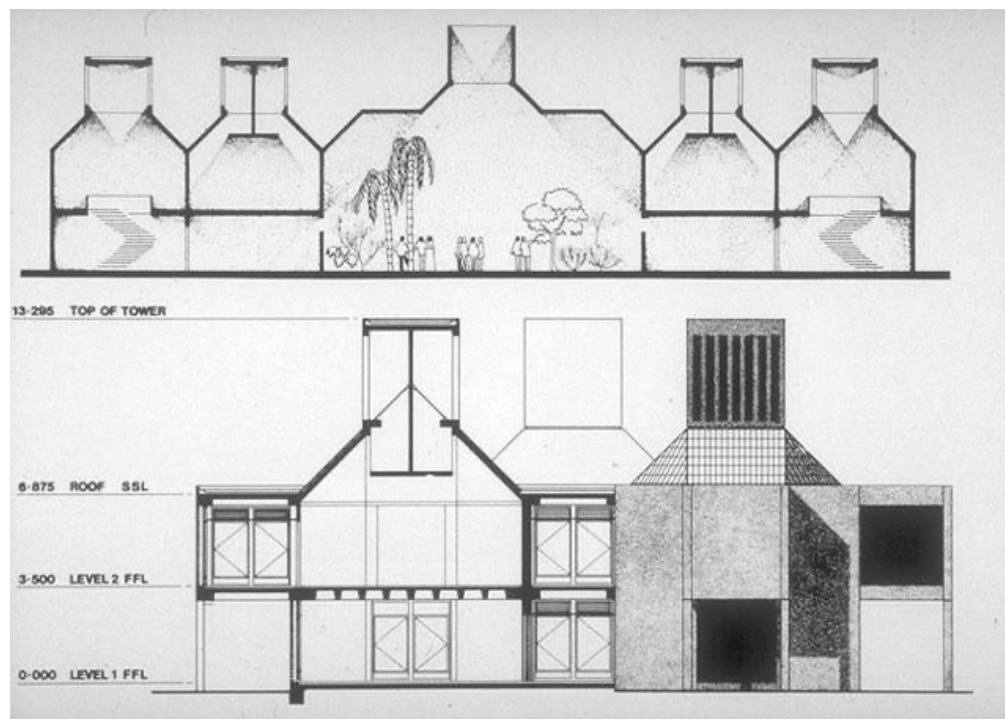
Section and elevation drawings of Qatar University academic building unit, showing wind tower chambers, roof SSL levels, and floor levels. Source: Archnet, [archnet.org/sites/288](https://archnet.org/sites/288).
